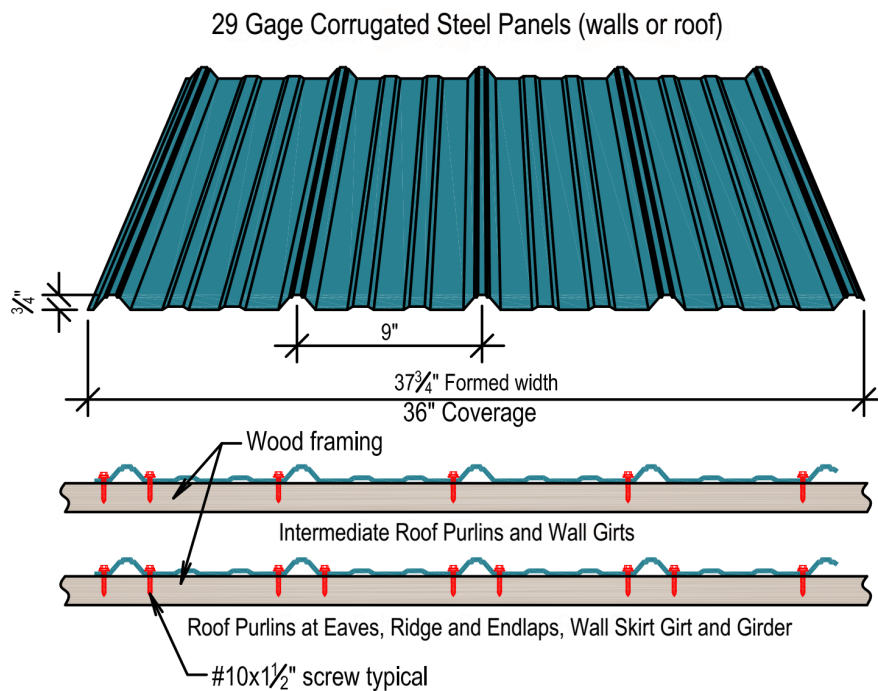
29 Gauge metal roof and wall panel fastening schedule
